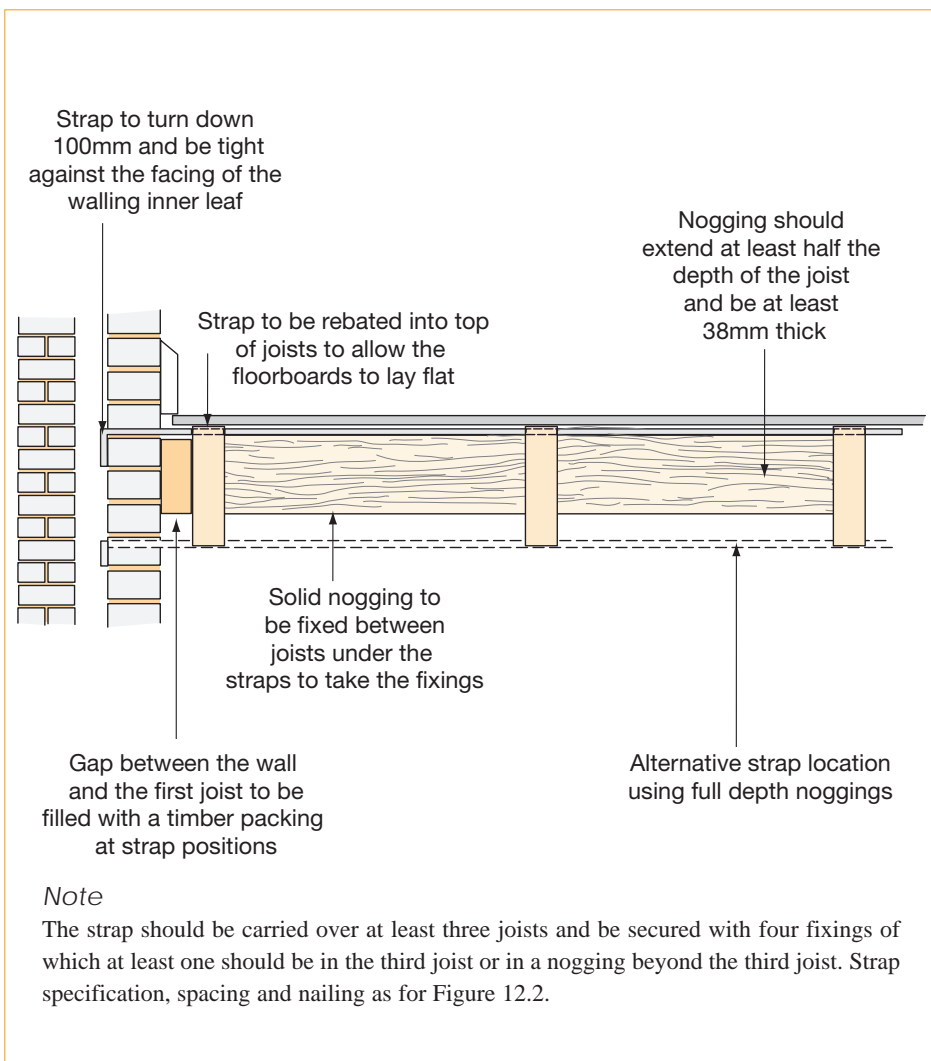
Timber joists spanning parallel to a blockwork wall
